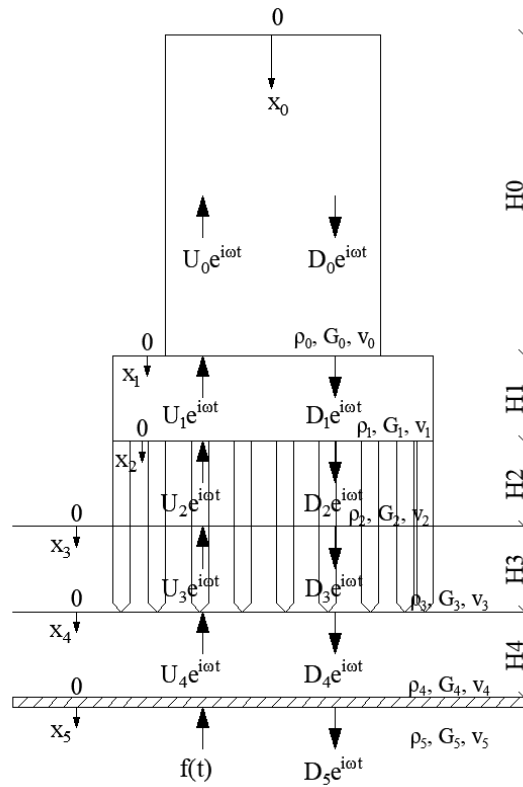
Model of “structure – piled raft foundation – layered soil” system.
